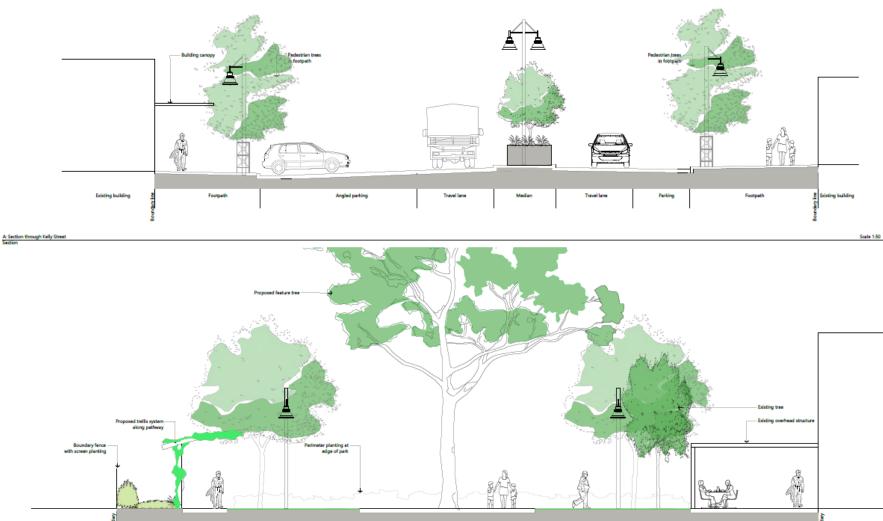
General cross section of the proposed Kelly Street footpath and roadway layout (upper cross section) and the new St Aubins Park design (lower cross section).
